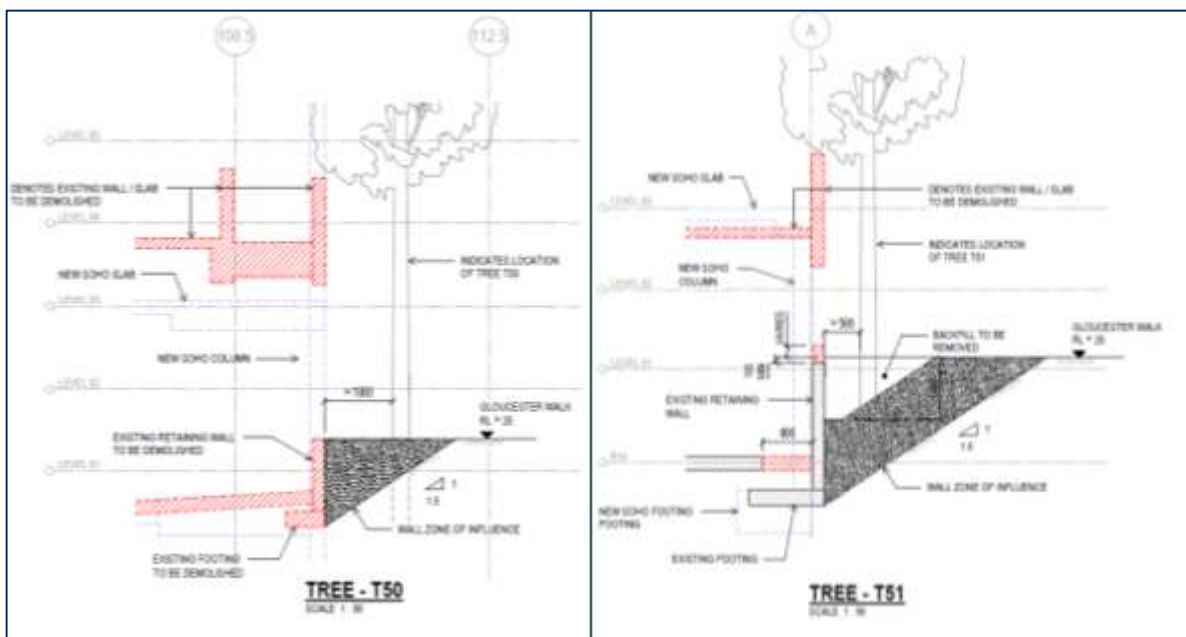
| Location of Trees 50 and 51 (Source: Approved Landscape Plan Basement B2-B1)
